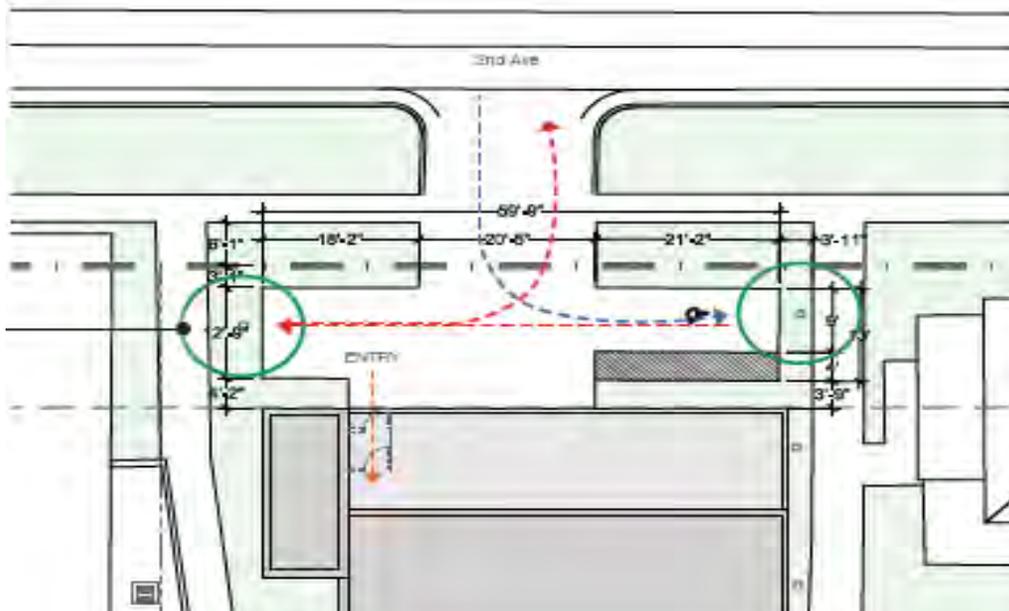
2nd Avenue Entrance Design with Accessible Parking Stall
